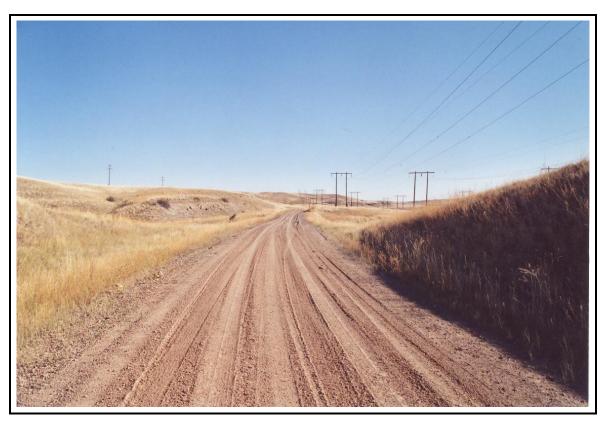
Section of the 24CA416 road located midway between the Rainbow and Ryan hydroelectric facilities. View to the Northeast.
